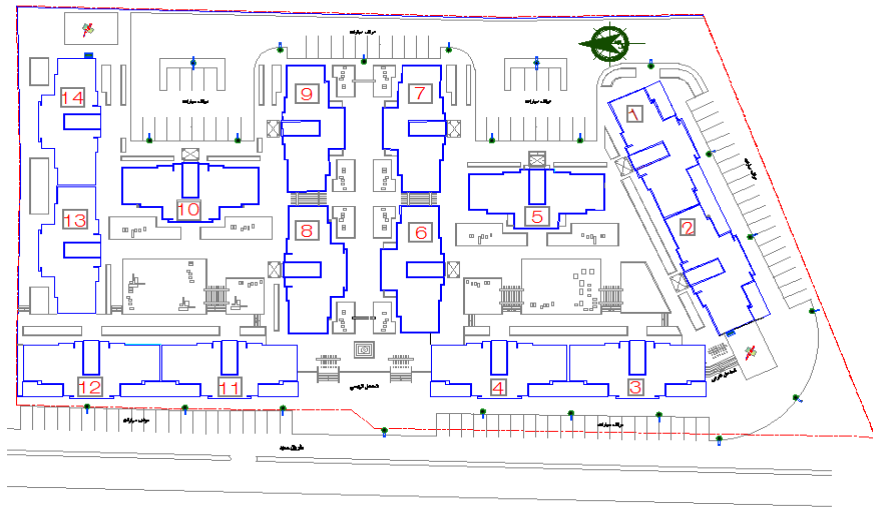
Layout plan, Ghot Ash Ahaal Housing Project
